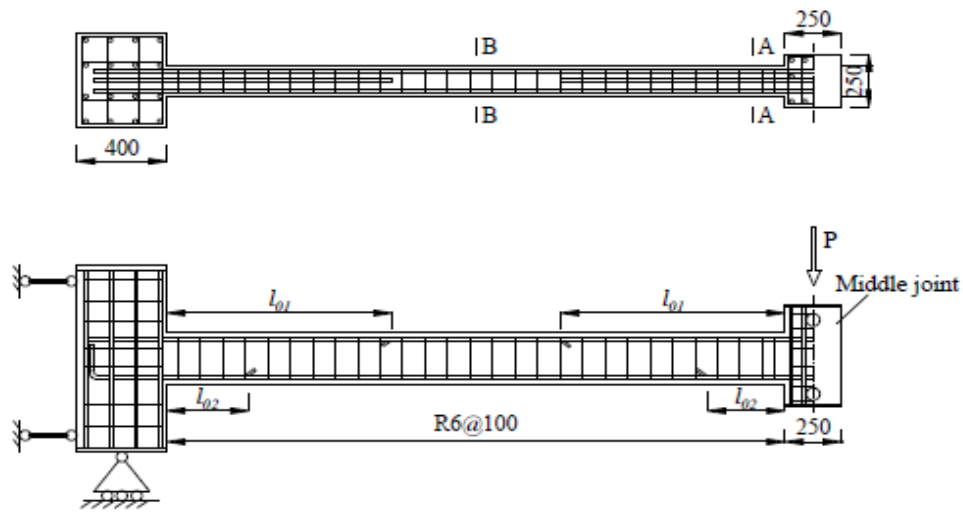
Elevation and plan view of the tested specimen (Yu & Tan 2013b)
